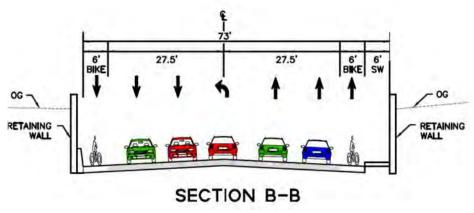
(cont.): Mary Avenue Underpass Tunnel Alternative (Cross-Sections)
